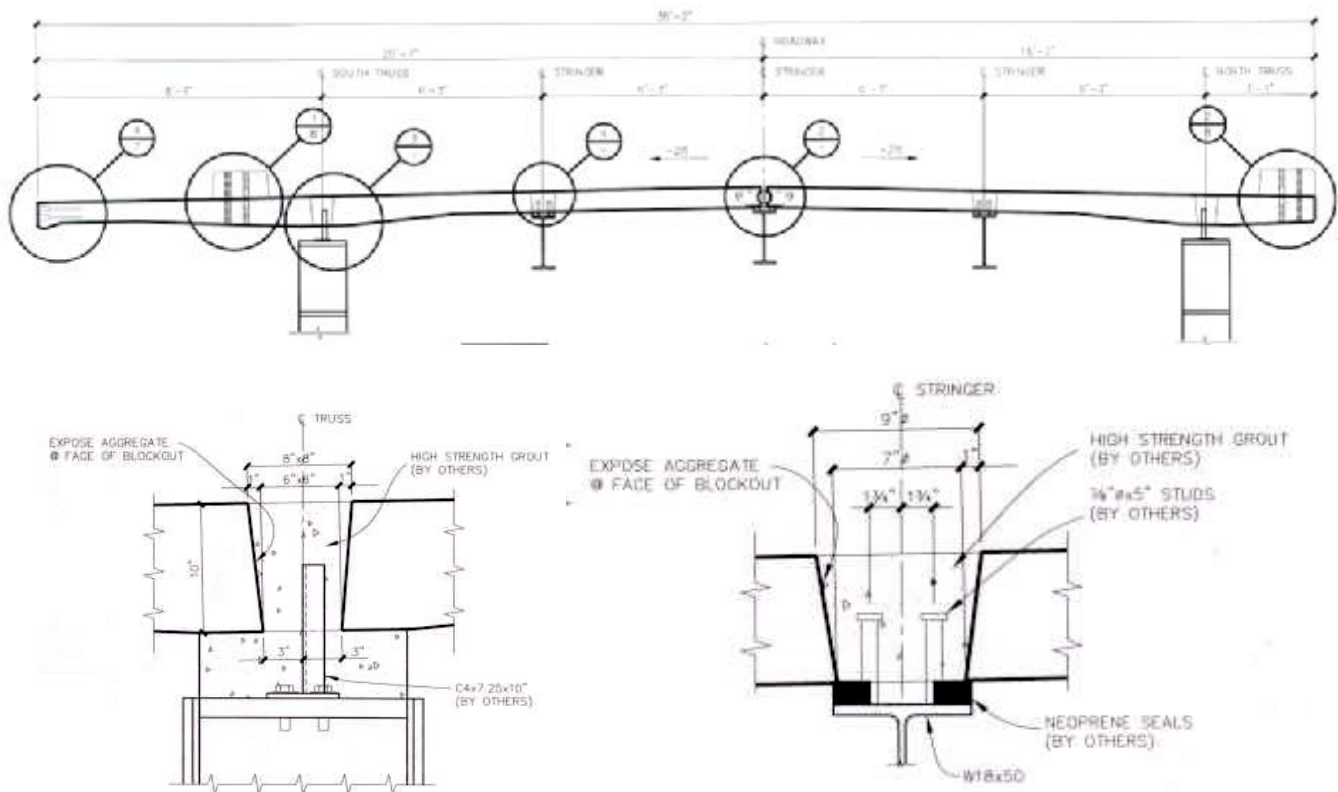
Cross section of the new deck slab and composite connection details
